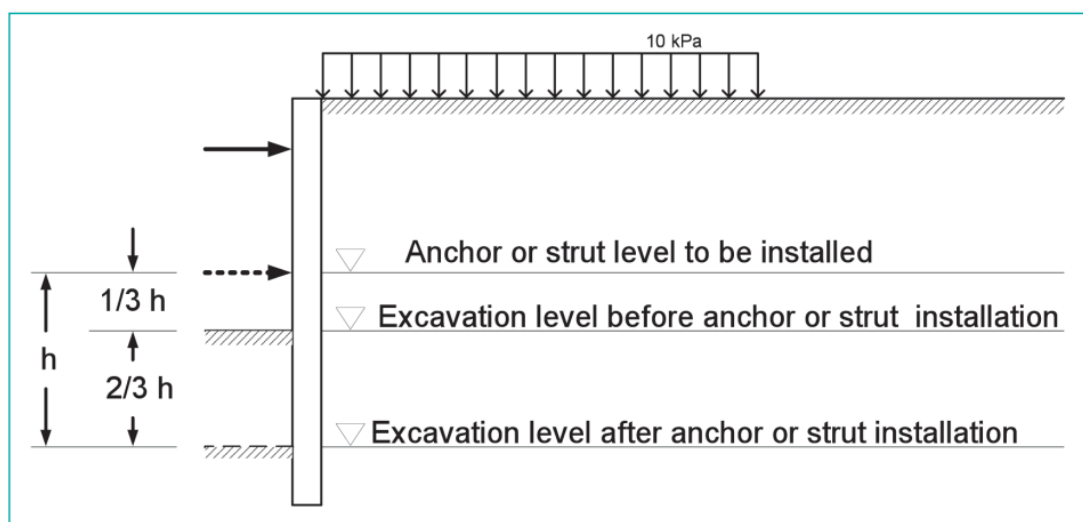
5: Excavation limit before installing anchors or struts (EAB 2008)
